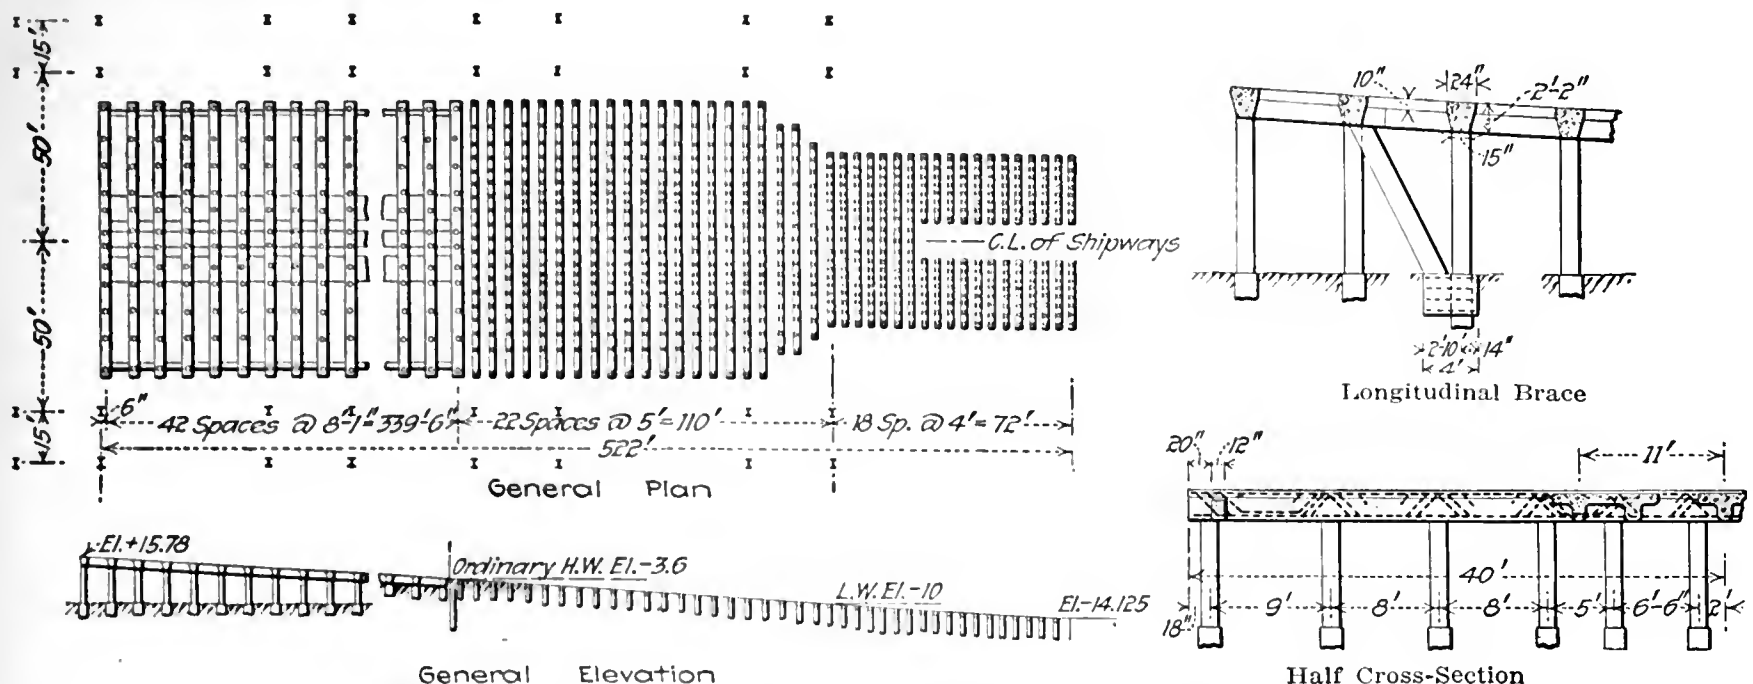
CONCRETE PILE-BENT SHIPWAYS AT THE SUN SHIPYARD
